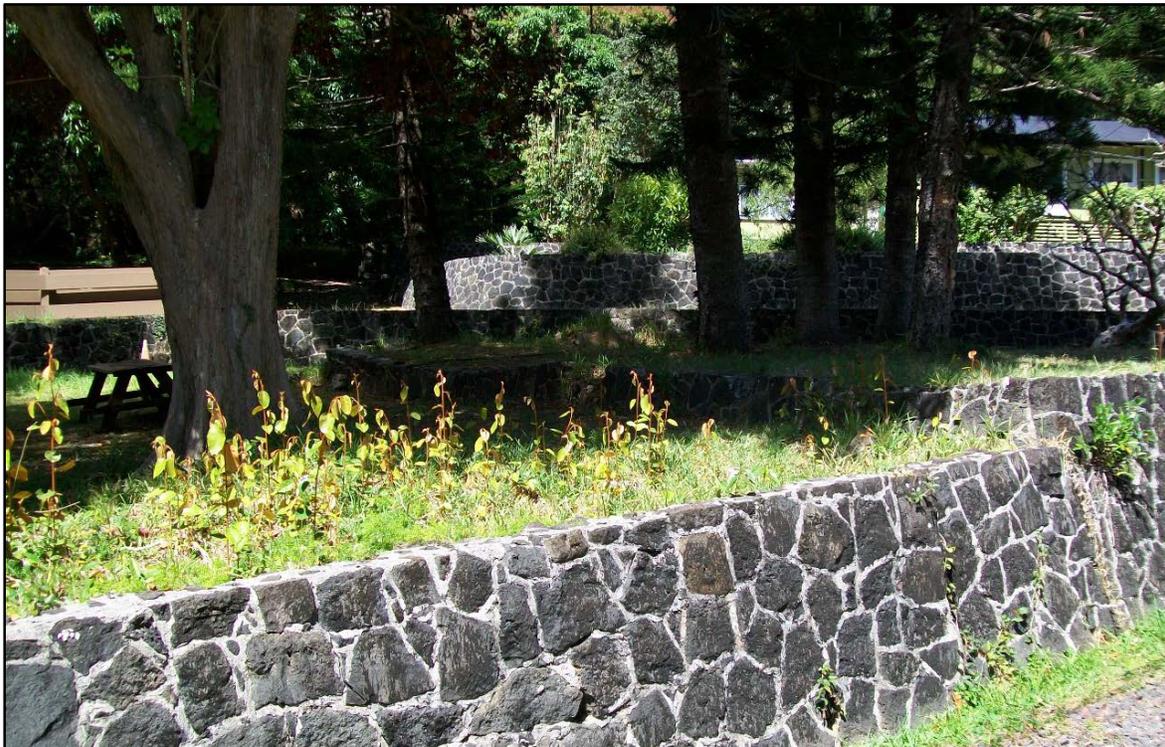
Terrace walls on either side of a driveway in the southwest additional project area
